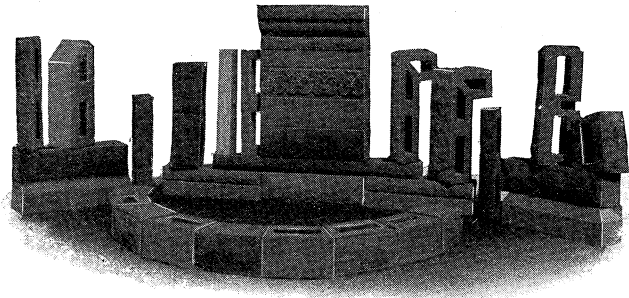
Collection of Concrete Blocks, Made on the Winget Machine.
